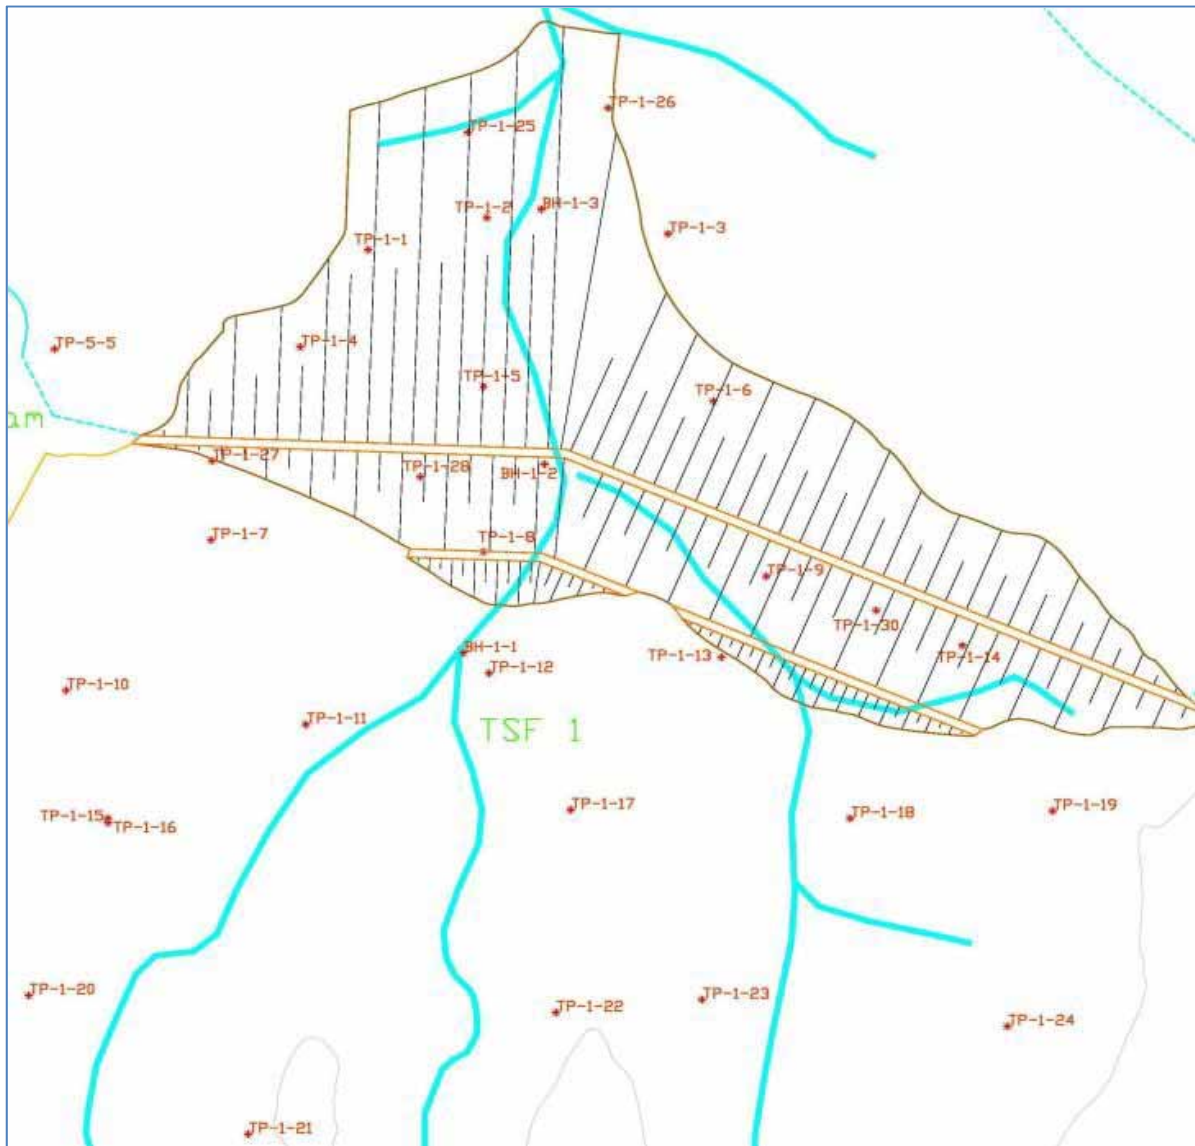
TSF Area - Geotechnical Boreholes and Test Pit Locations
